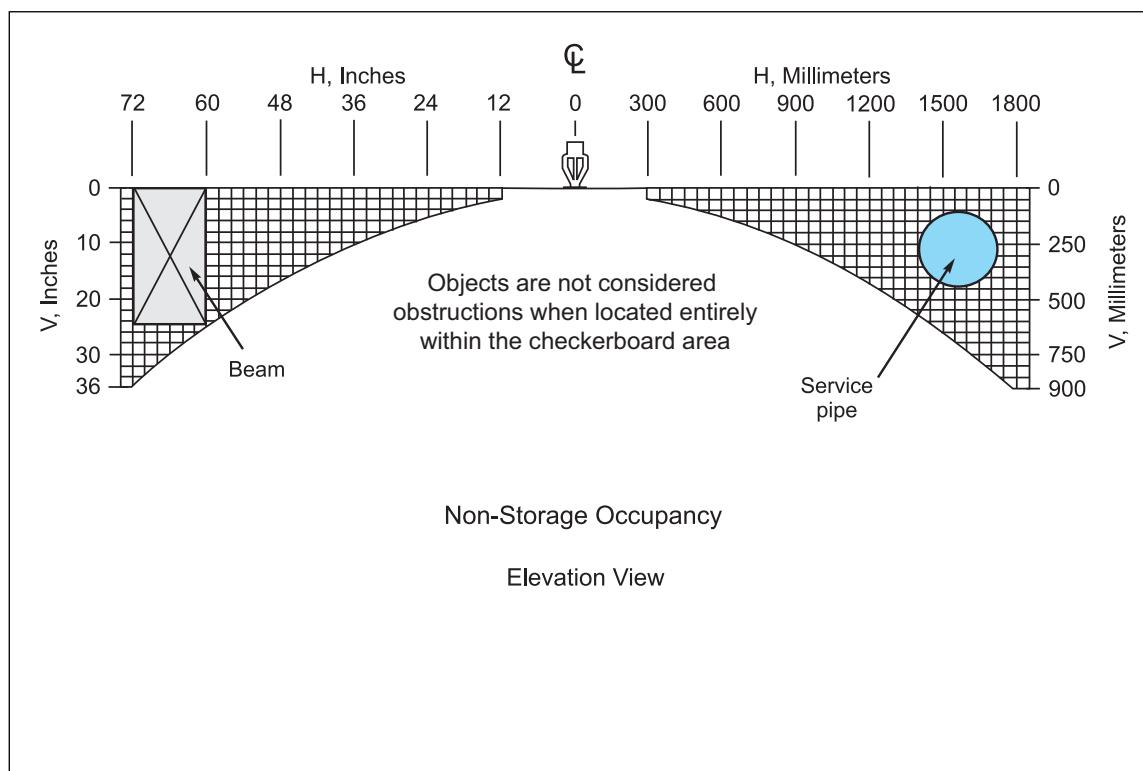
(a). Objects near ceiling level not considered obstructions to standard-coverage Nonstorage pendent and upright sprinklers
